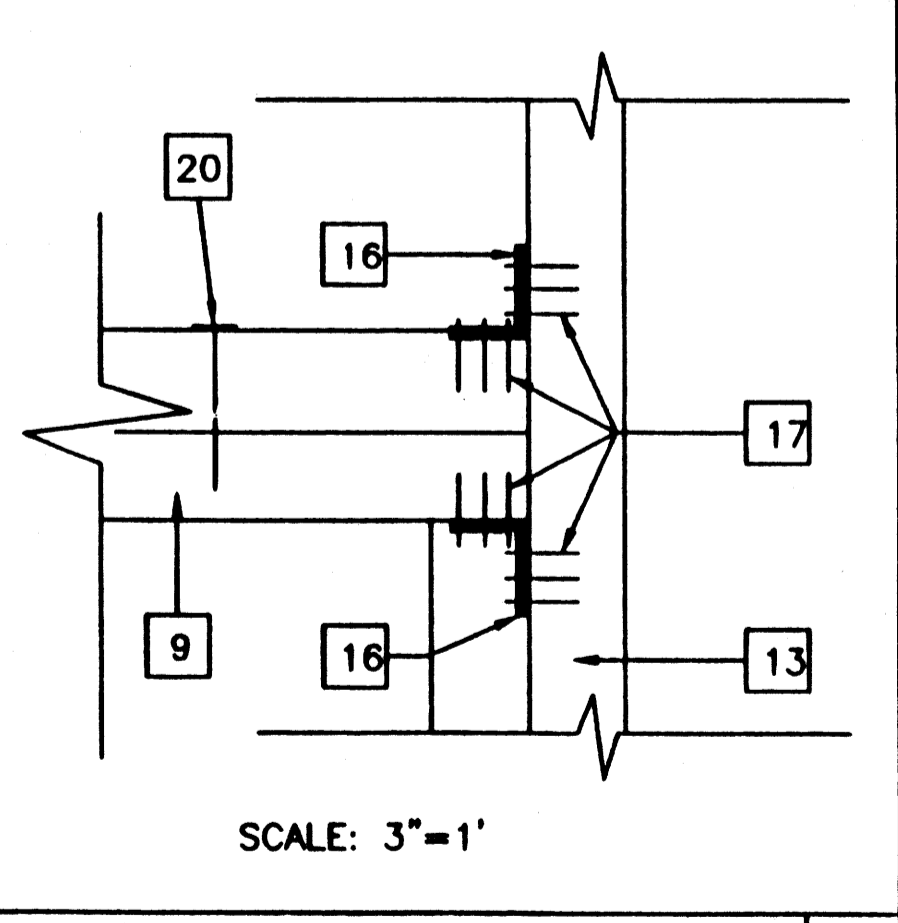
DETAIL AT VERT. PLYWOOD EDGES 1 SCALE: 3"=1'
